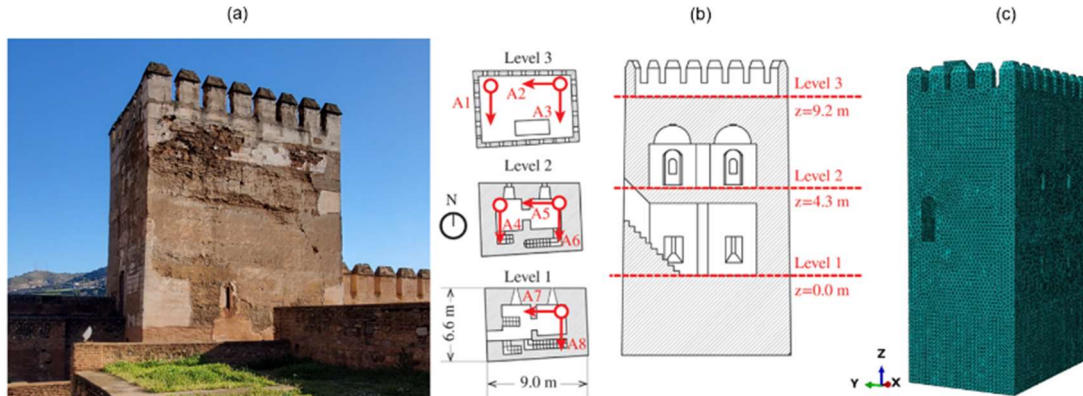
The Muhammad Tower (a). Sensors Layout (b) and finite element model (c)
